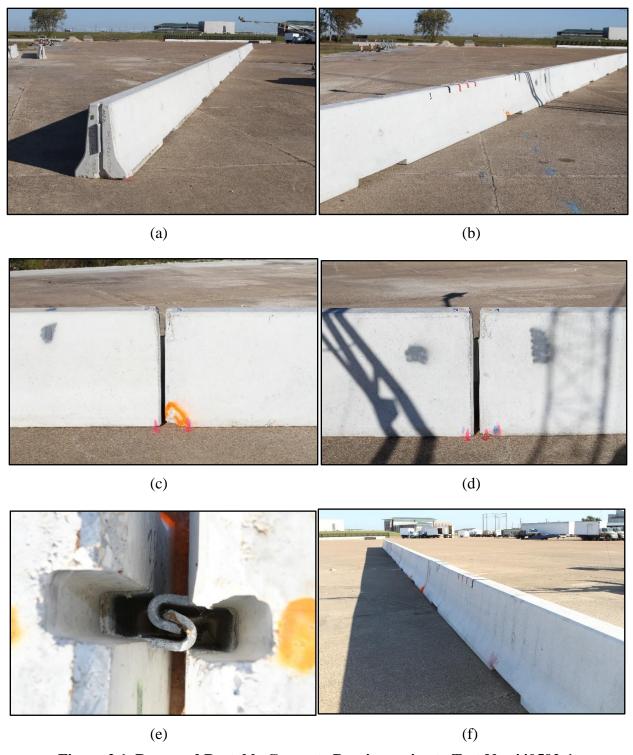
Damaged Portable Concrete Barriers prior to Test No. 440592-1.
